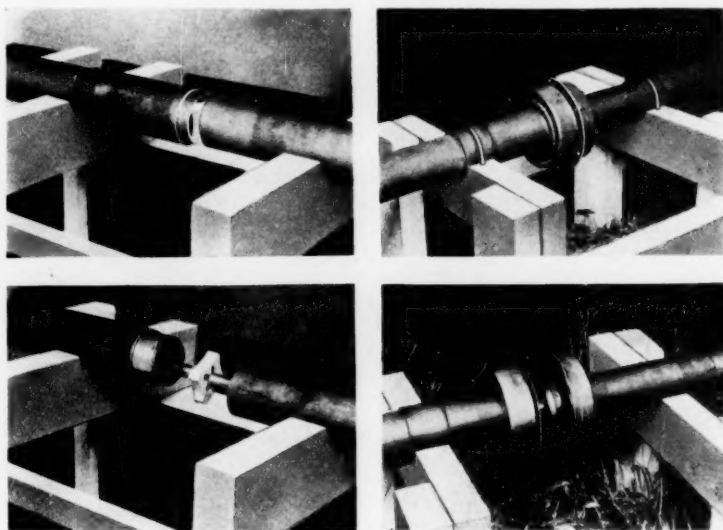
Experimental expansion and lock joints for large sizes of concentric tube line.
